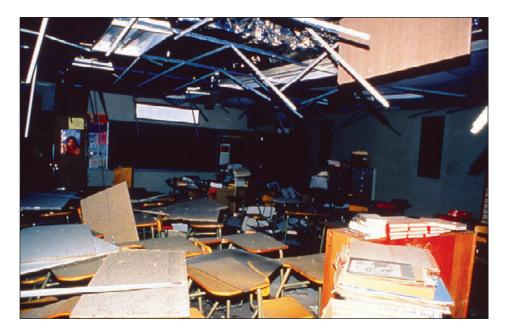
Ceiling damage, Northridge, CA, 1994 SOURCE: GARY MCGAVIN, REDLANDS. CA
